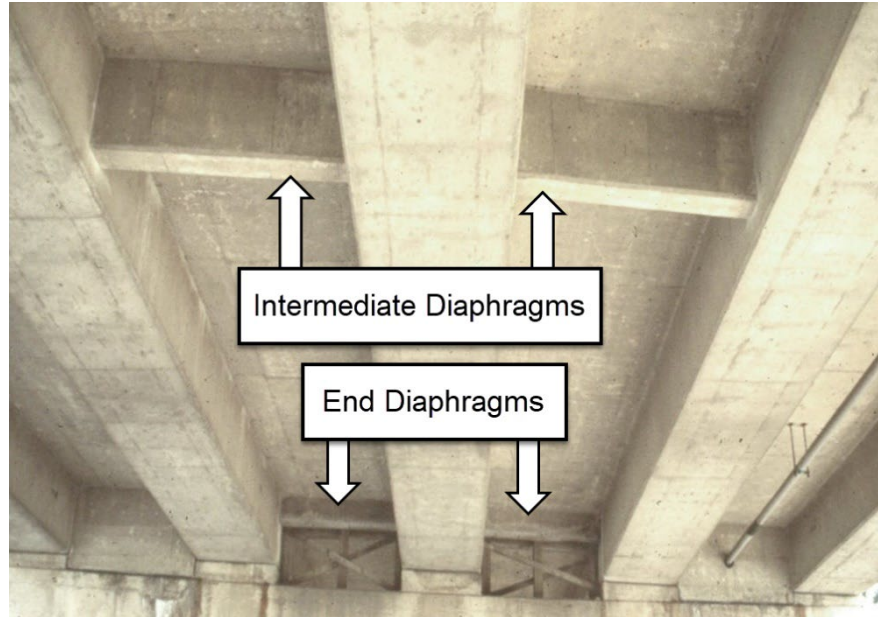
End and Intermediate Diaphragms on a Spread Box Beam Bridge
